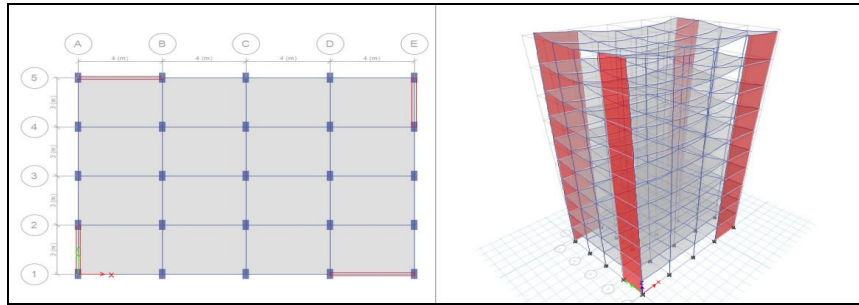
Unsymmetric pattern frame with shear wall and flat slab
